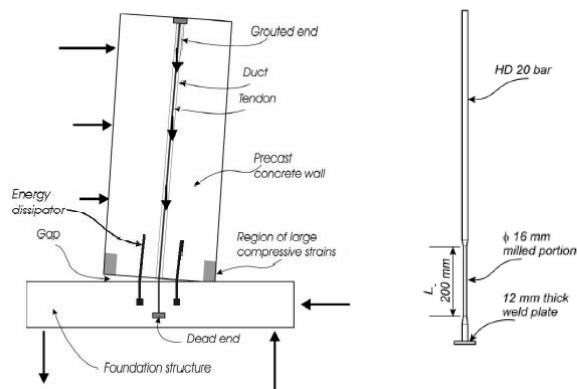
(a) Hybrid Reinforced Concrete Cantilever Wall System, (b) Energy dissipator installed [16]
